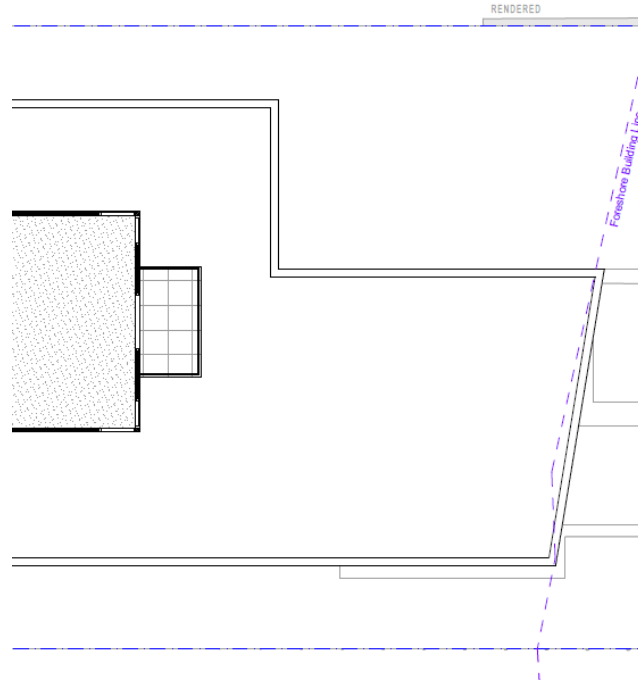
Extent of existing works below the Foreshore Building Line (max 470mm)
